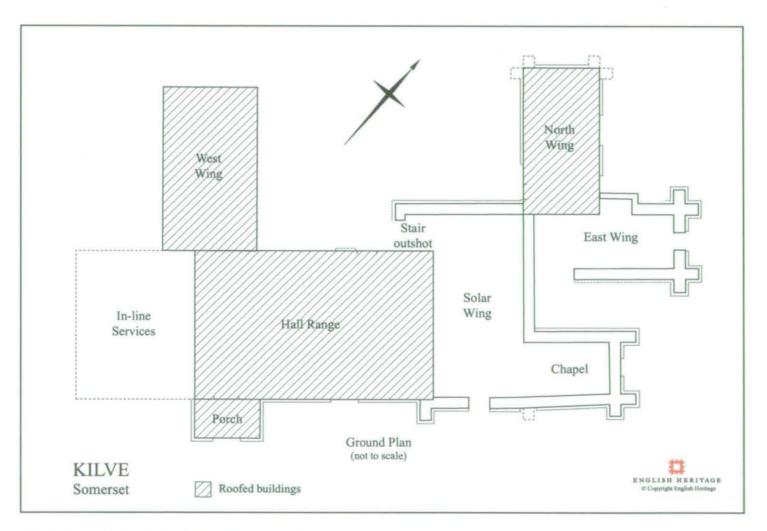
Ground plan, Kilve, Somerset (not to scale).
